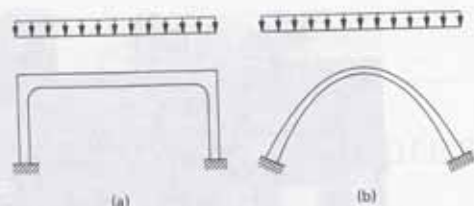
Reinforced concrete rigid frame and arch.
